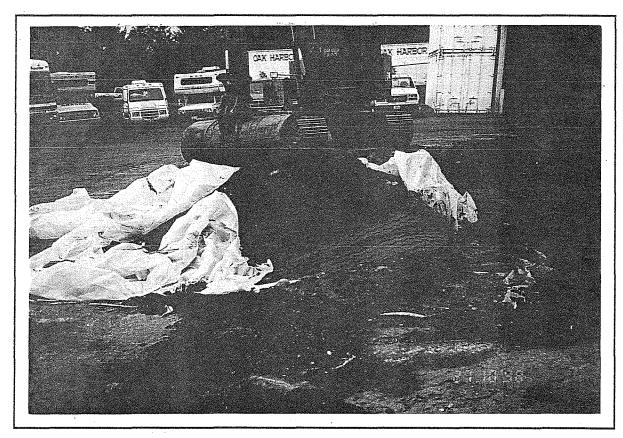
Contaminated Soil from Below the O/W Separator. Note 1,000-g Waste Oil Tank in Background.
